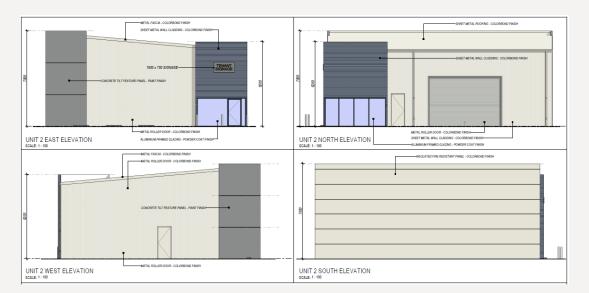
| Unit 2 elevations (Source: David Menz Building Design)
